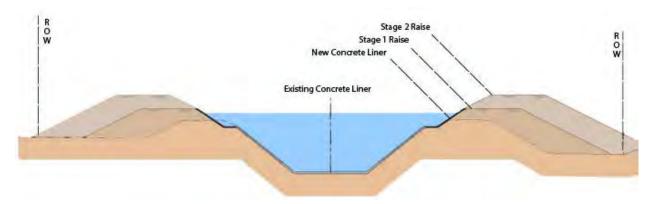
Typical Canal Enlargement Cross Section with 10-ft Slope Stability Bench
